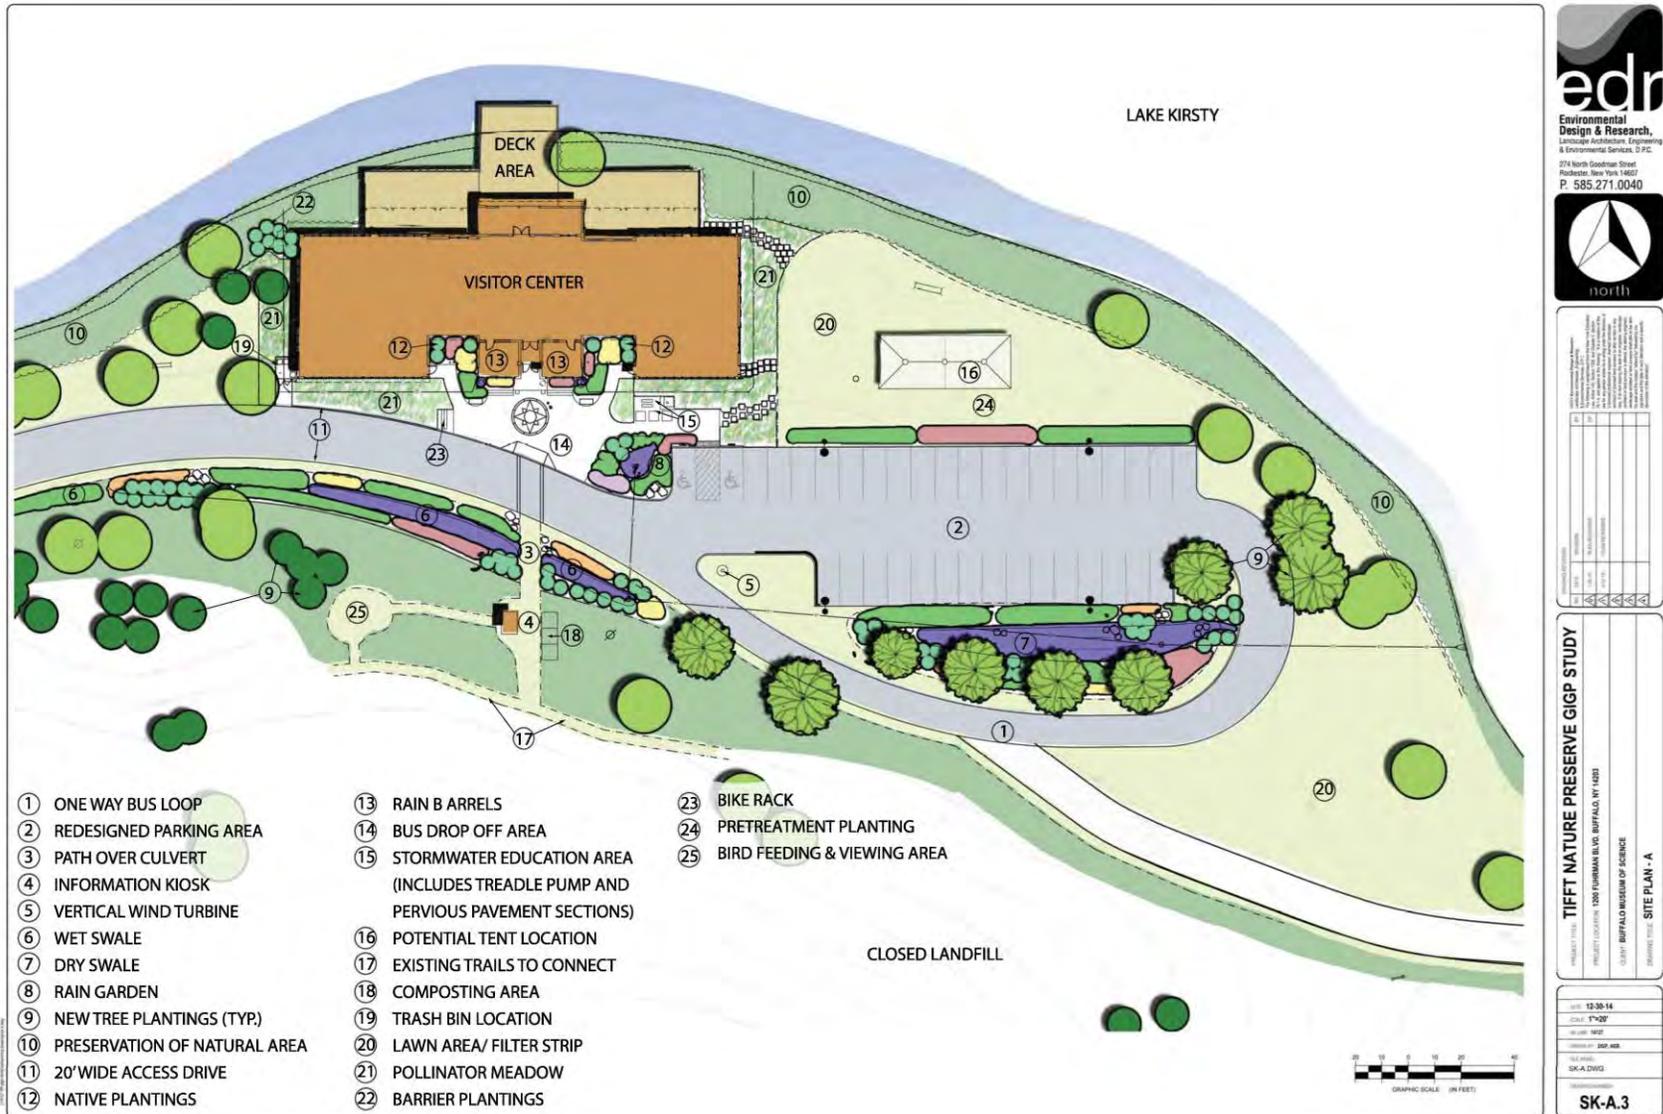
Conceptual drawing of access improvements, green infrastructure and native landscaping site plan for Tift Nature Preserve
